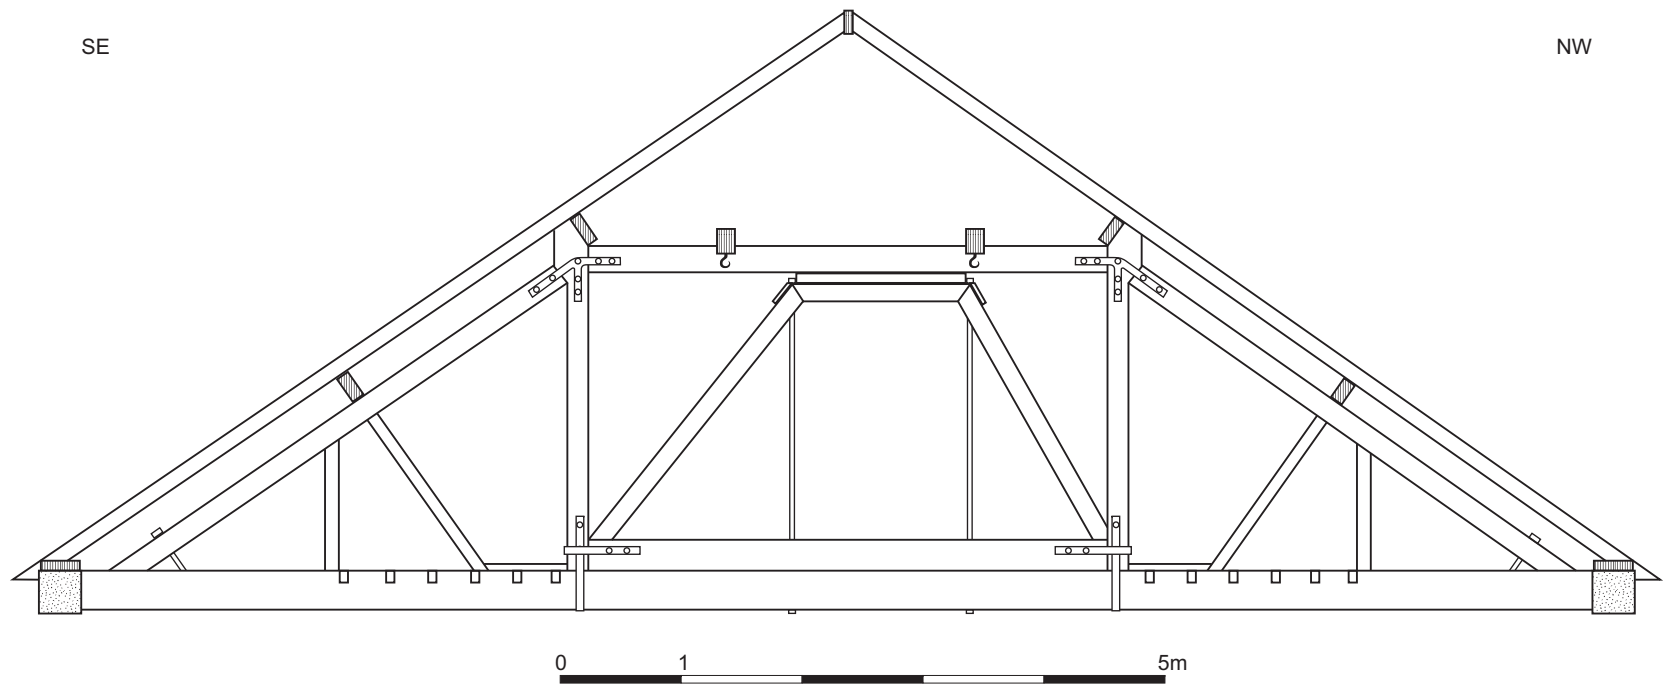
Elevation of truss with additional bracing. Scale 1:40
